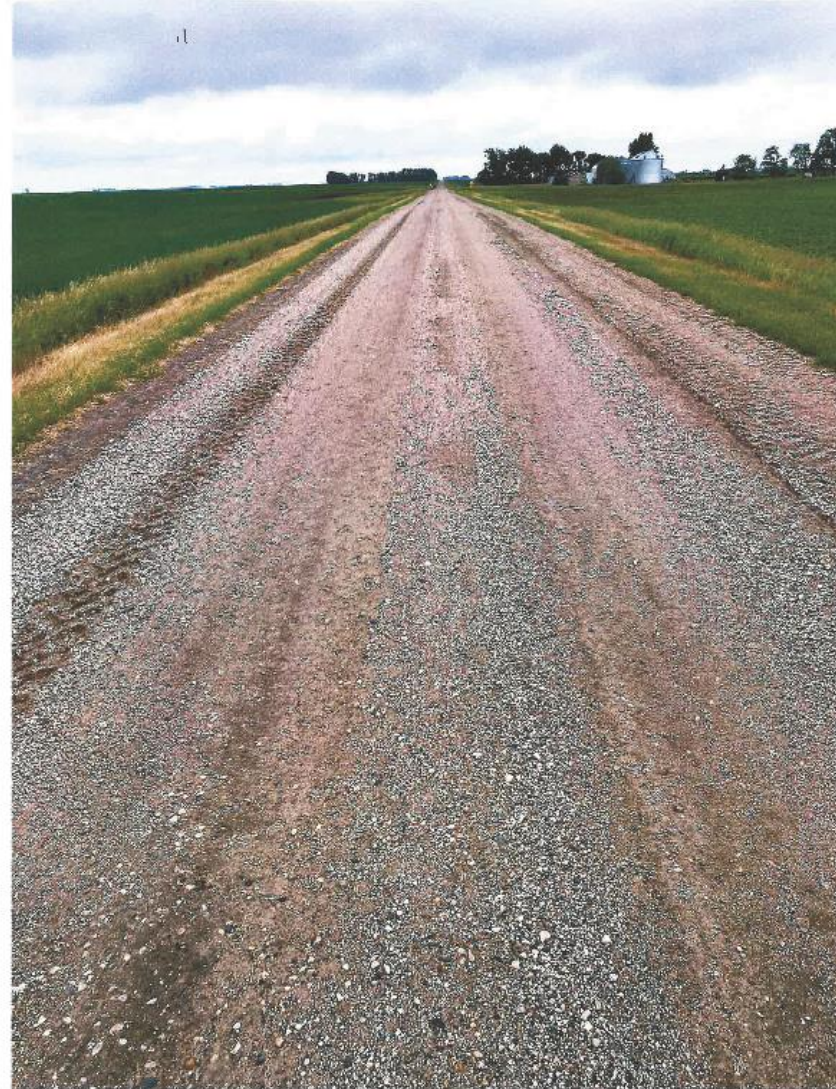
PHOTOS OF DAMAGE SITES: MULTIPLE ANGLES
